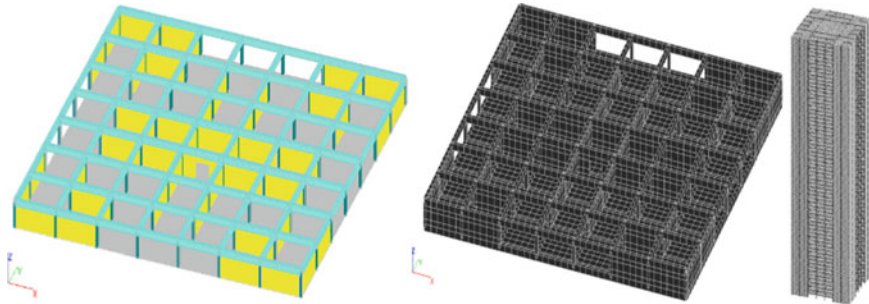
Model of a typical floor (left) and finite element model of a building (right)
